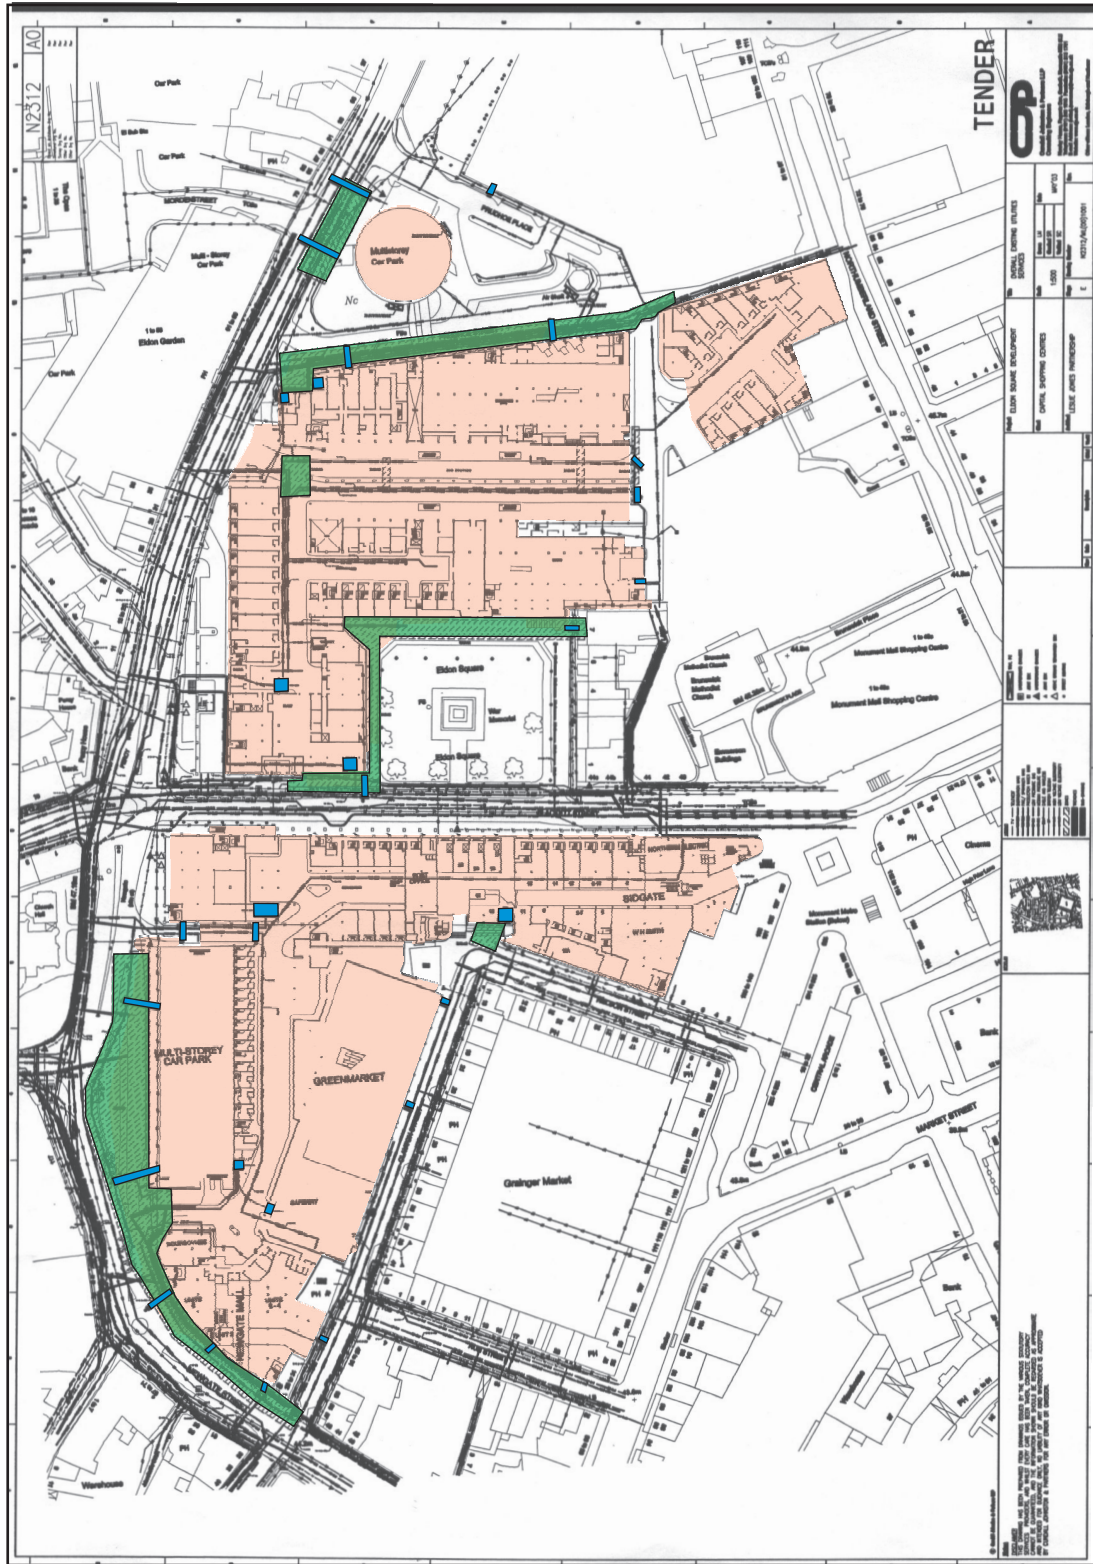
The development area (shaded pink, red outline) showing locations of principal groundworks (shaded green) and geotechnical test trenches (blue)
